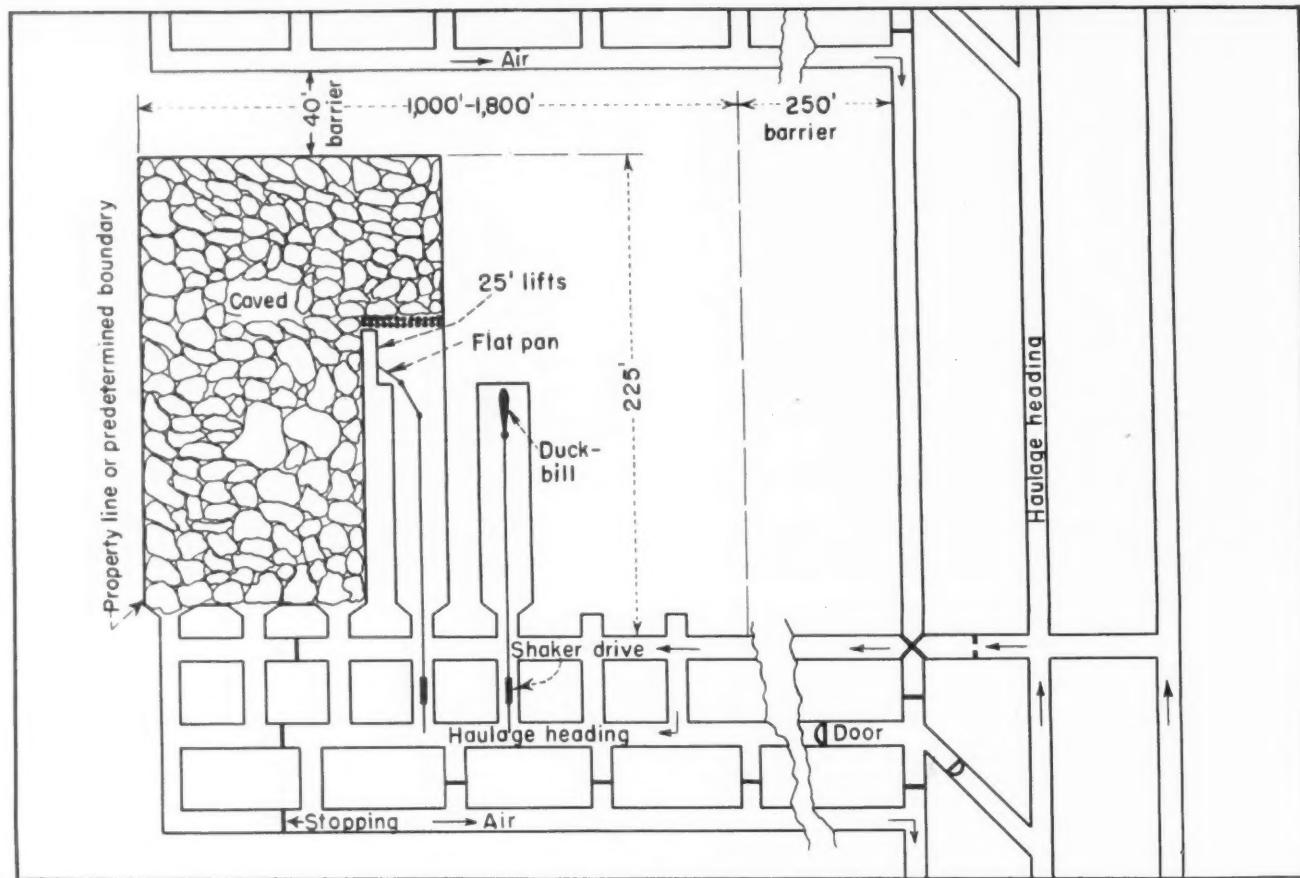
EAGLE PANEL PLAN showing retreat mining of rooms and pillars.
